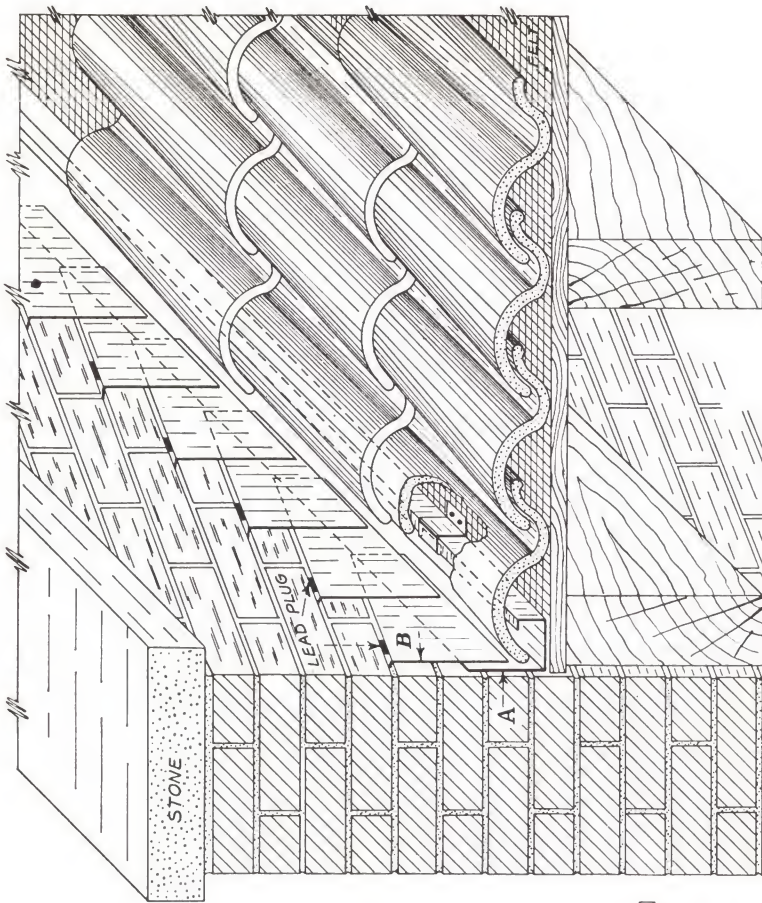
METHOD OF APPLYING COMBINATION BASE FLASHING AND VALLEY, USED IN CONNECTION WITH SPANISH TILE ROOFING - SCALE 1"=1'-0"
